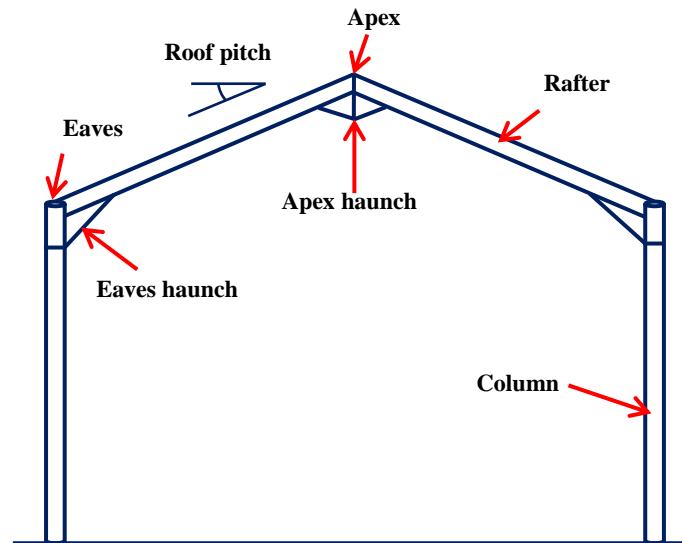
A typical symmetrical single-bay pitched portal frame (SCI, 2016).
